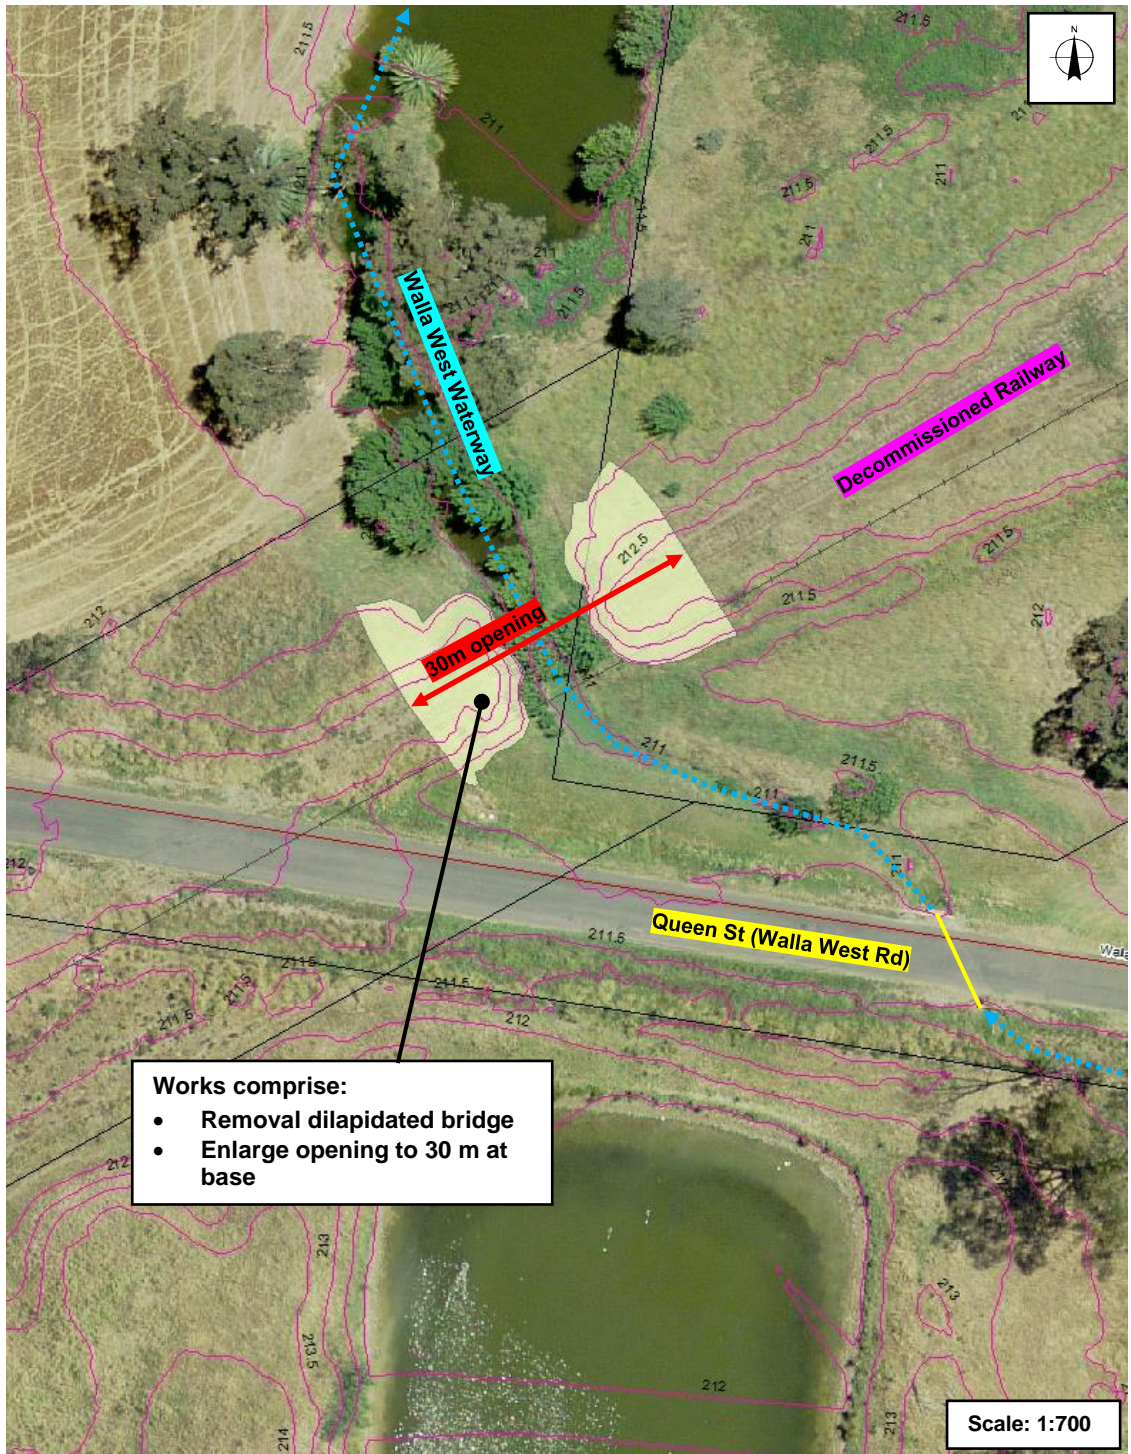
Walla West Waterway – Railway Bridge Removal & 30m Opening
